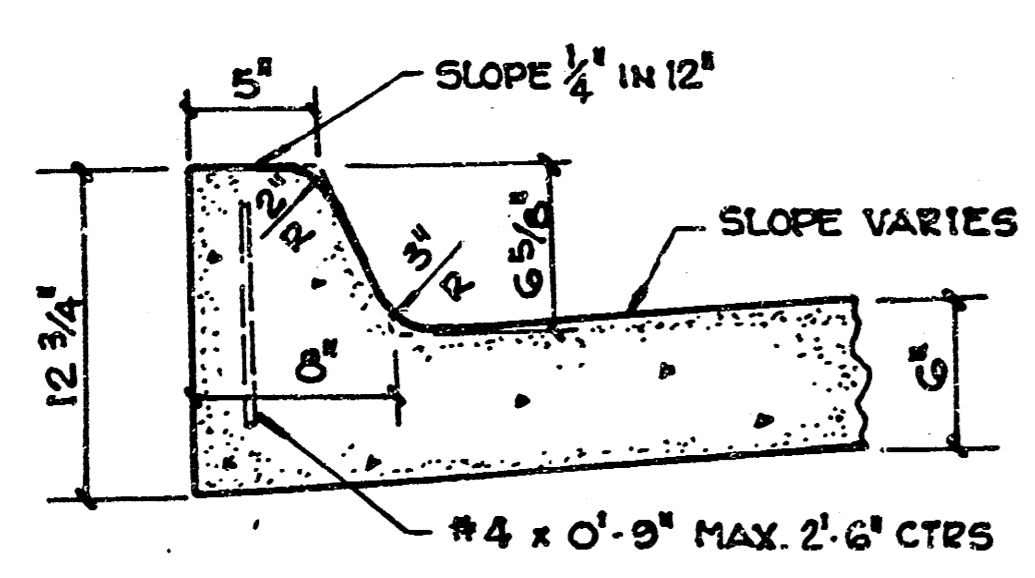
DETAIL: PAVEMENT WIDENING IN TAPERED SECTION. STA 30+35 TO STA 31+15 RT.
